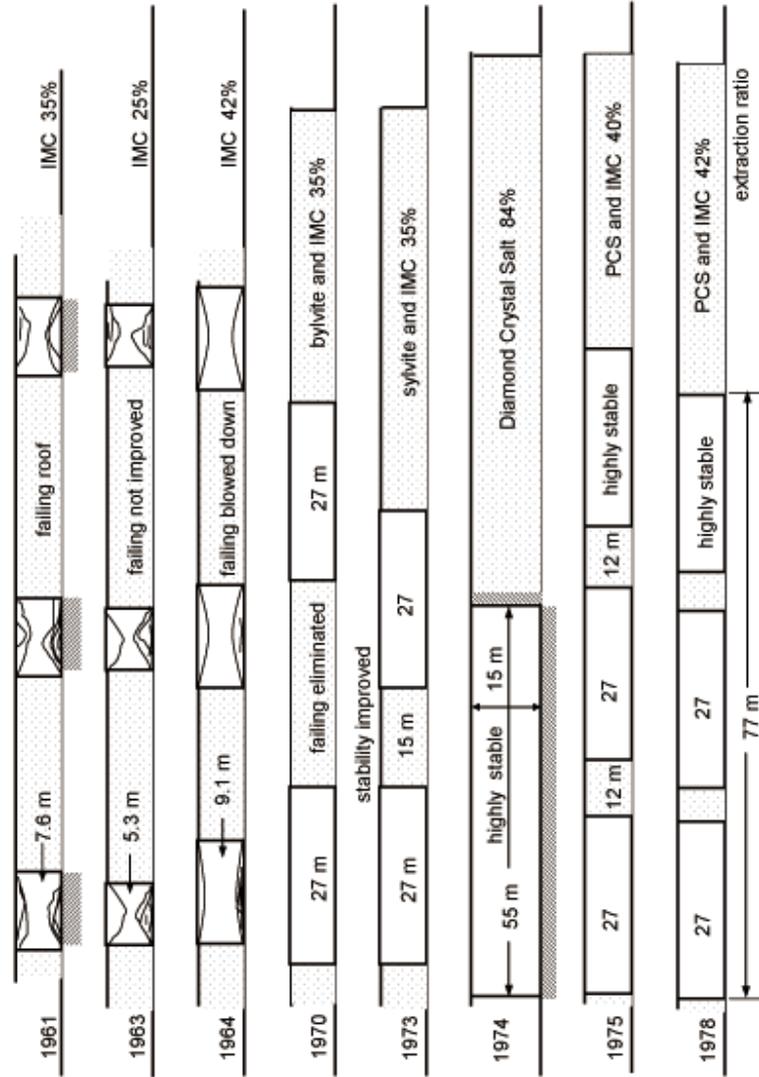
Field demonstration of Serata Stress Technology (SST) successfully applied to deep potash mining in Saskatchewan, Canada. The 77m room-pillar span excavated in 1978 has been stabilized naturally without roof bolting, while 5.3m rooms excavated in 1963 continued failing even with saturated roof bolting, vividly demonstrating the power of SST
